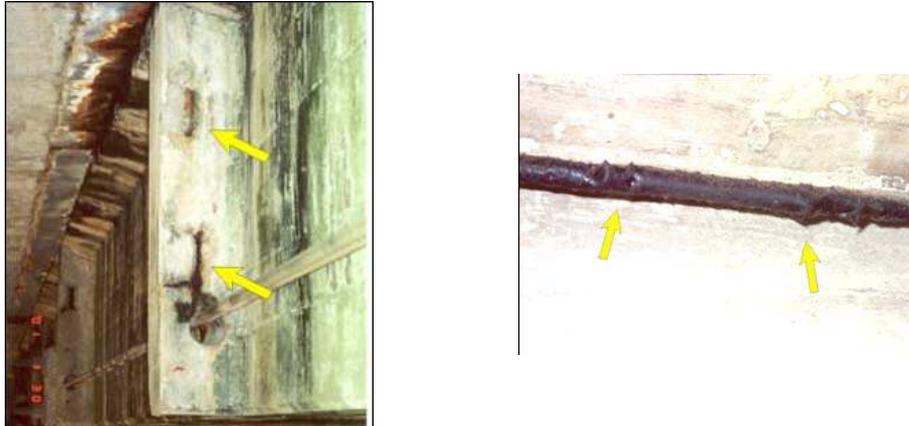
Damages in concrete anchorage regions and in the plastic duct of the mono-strands
